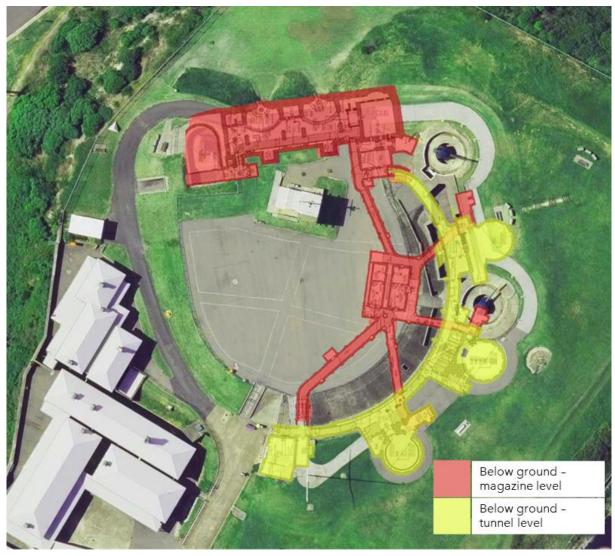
Aerial view over the gun emplacements and central parade ground. (Source: SIX Maps and drawings by Suters Architects, adapted by CPH)
